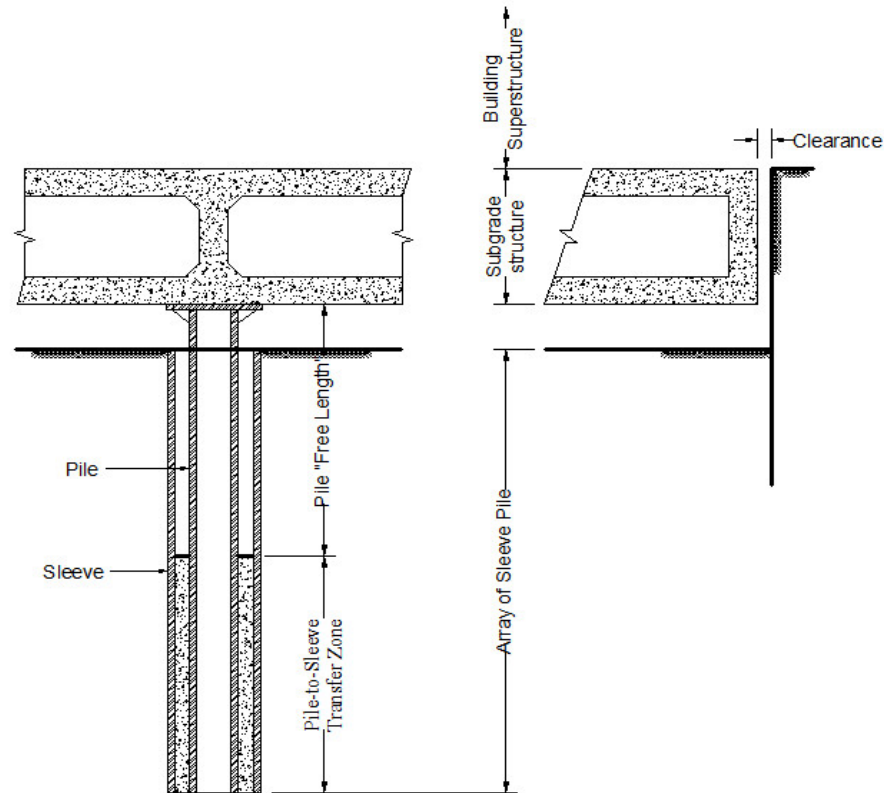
Schematic diagram of building on sleeved pile (Raupach et al., 1981)
